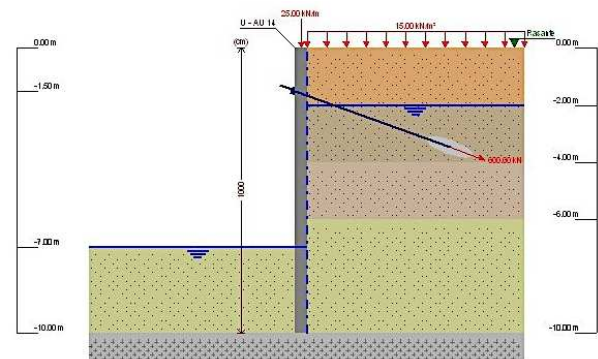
Design section for maximum water level difference for both sides of the sheet pile wall (anchor is schematic, not at scale)
